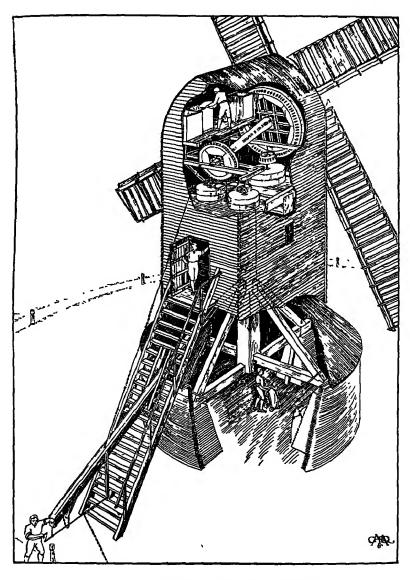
Showing how a Windmill Works. 14th-Century Mill, p. 164. Water-Mill, p. 115.
